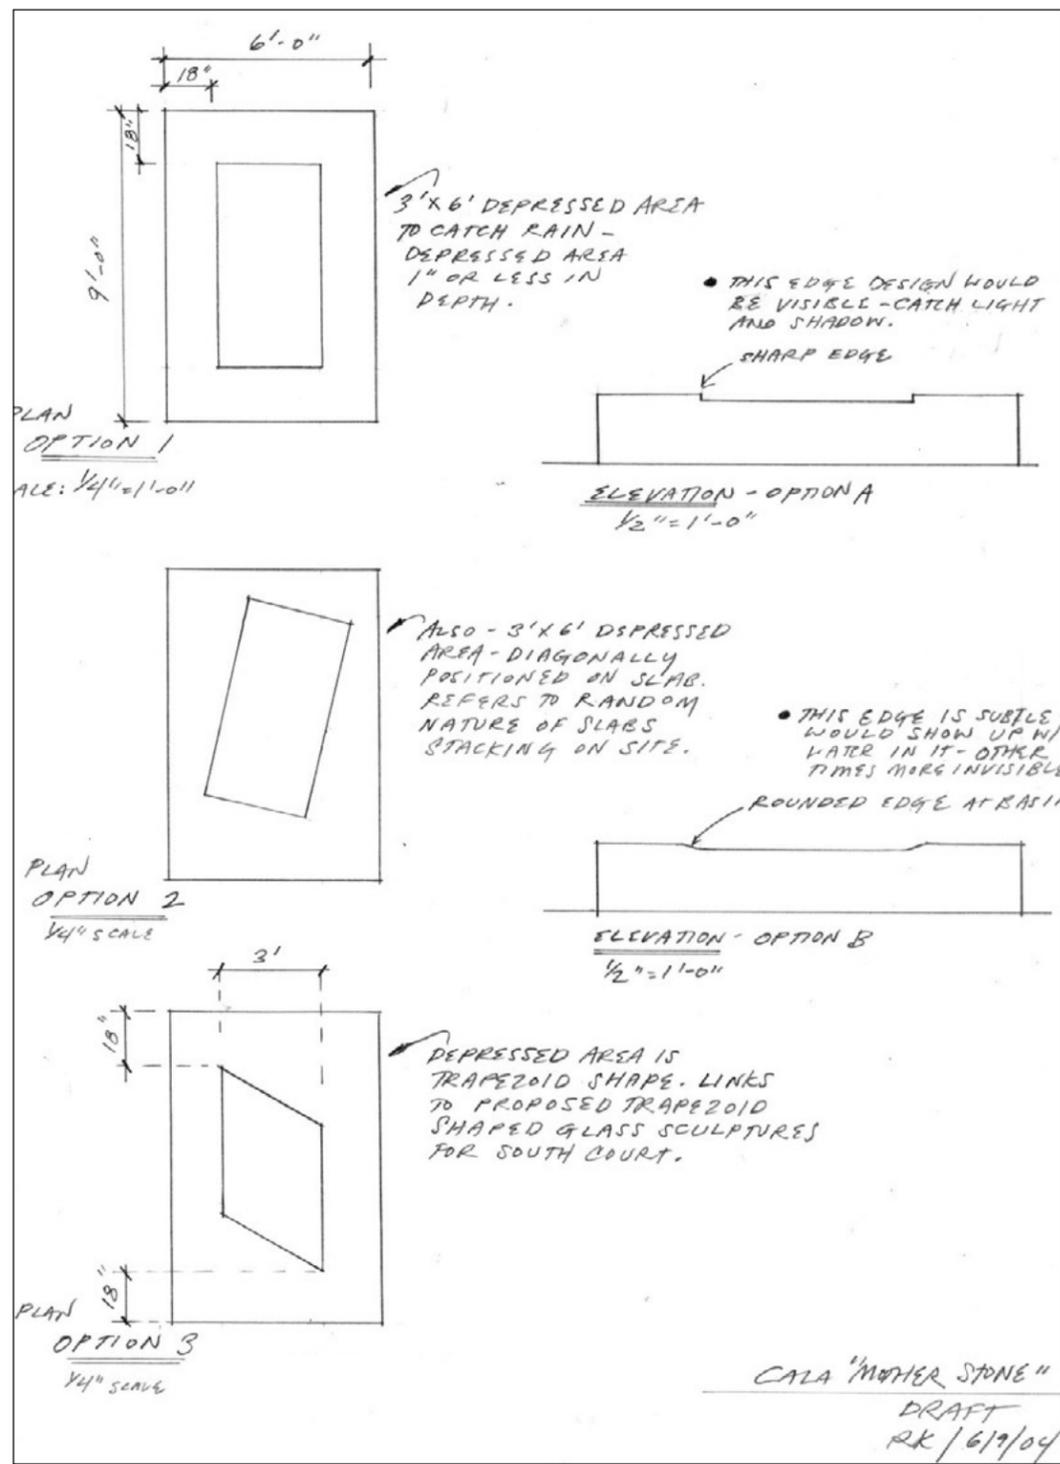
West Garden, Rapson Hall, study for Site Index, "mother stone," anorthositic gabbro block, Rebecca Krinke, pencil sketch, 2004.
